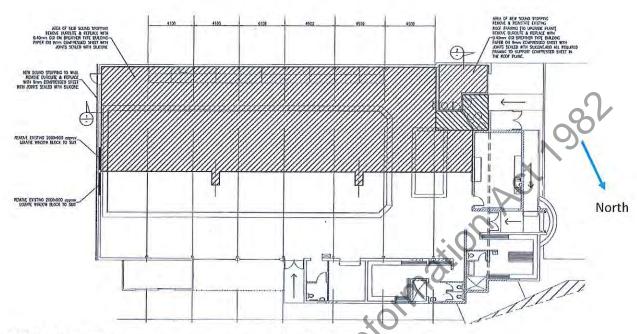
Floor plan showing extent of cement fibre sheeting (hatched), installed in 1999
